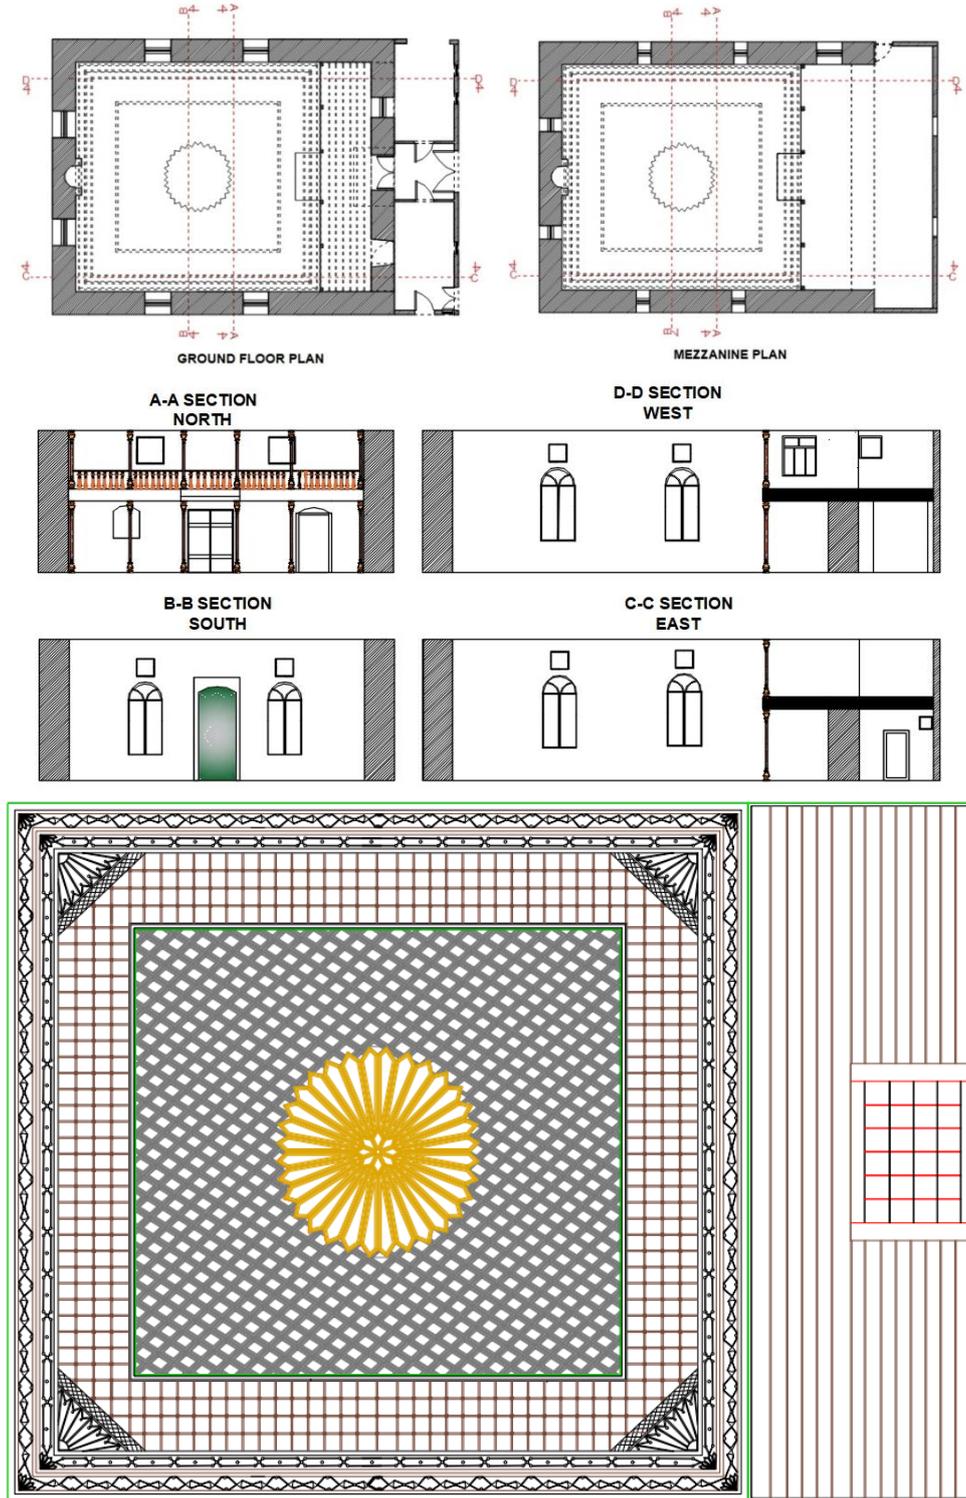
Ünür Village Old Mosque ground floor plan and mezzanine plan, sections and ceiling plan
